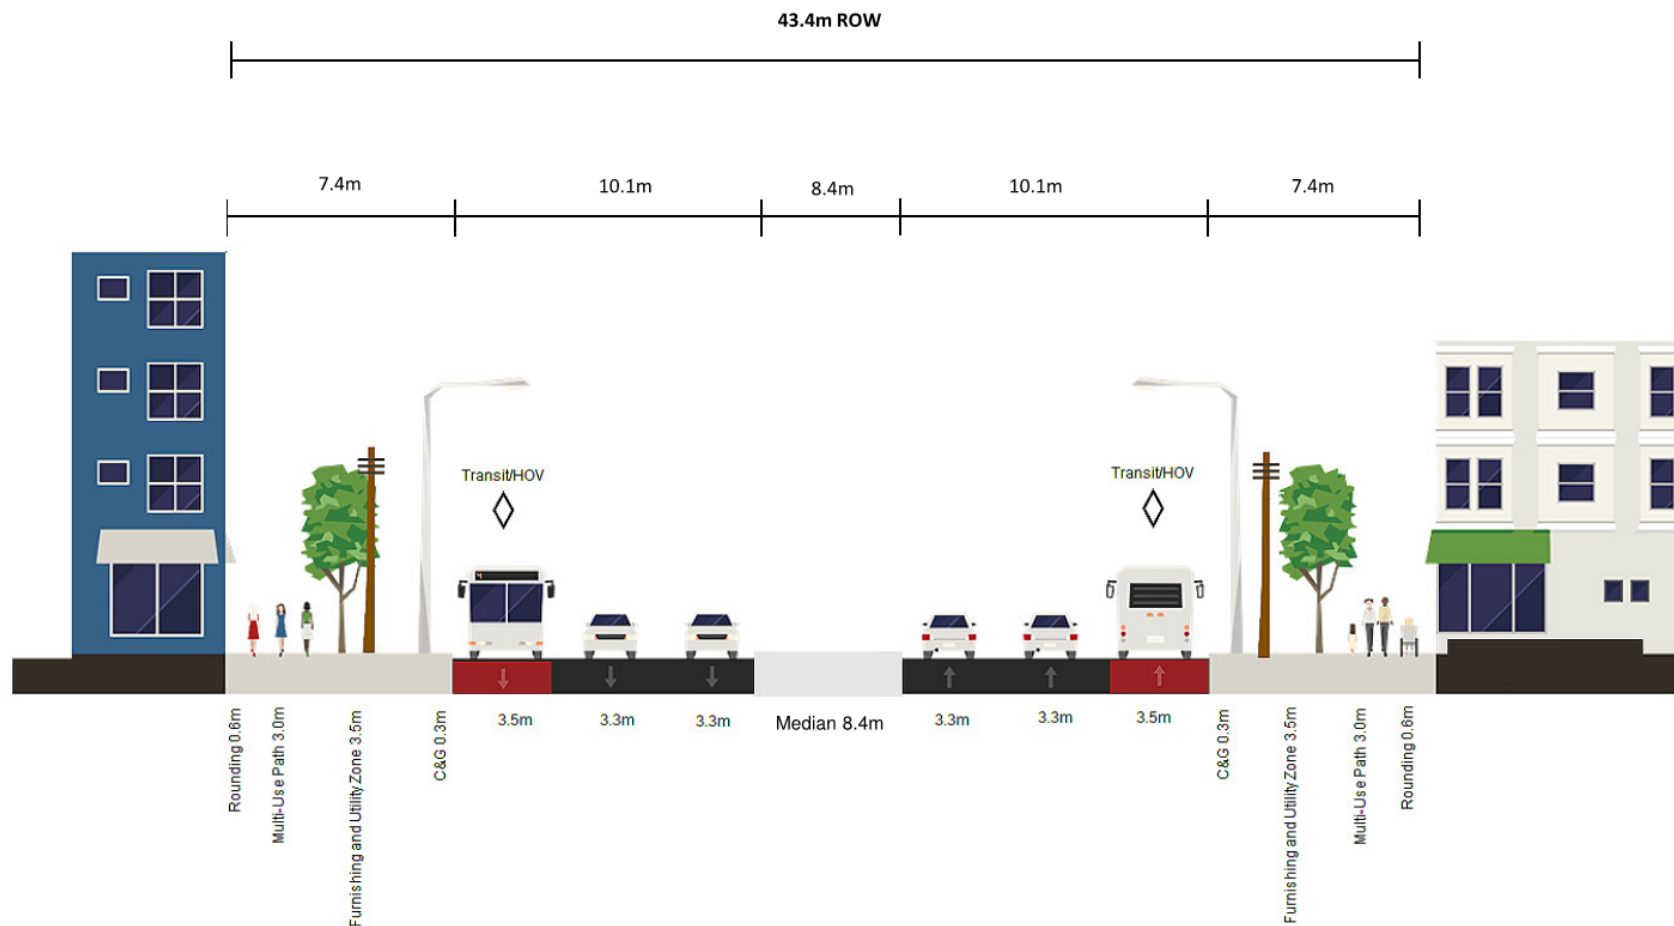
RECOMMENDED Intersection Typical Section – Six Lanes for Transit / HOV with AT facilities for Future Conversion
